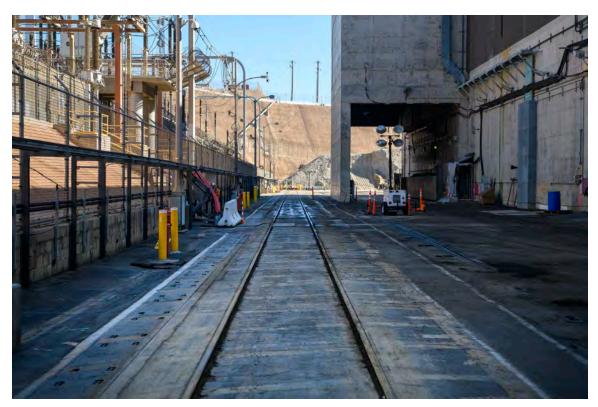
End of On-site Rail Spur (Looking South) (2022)
